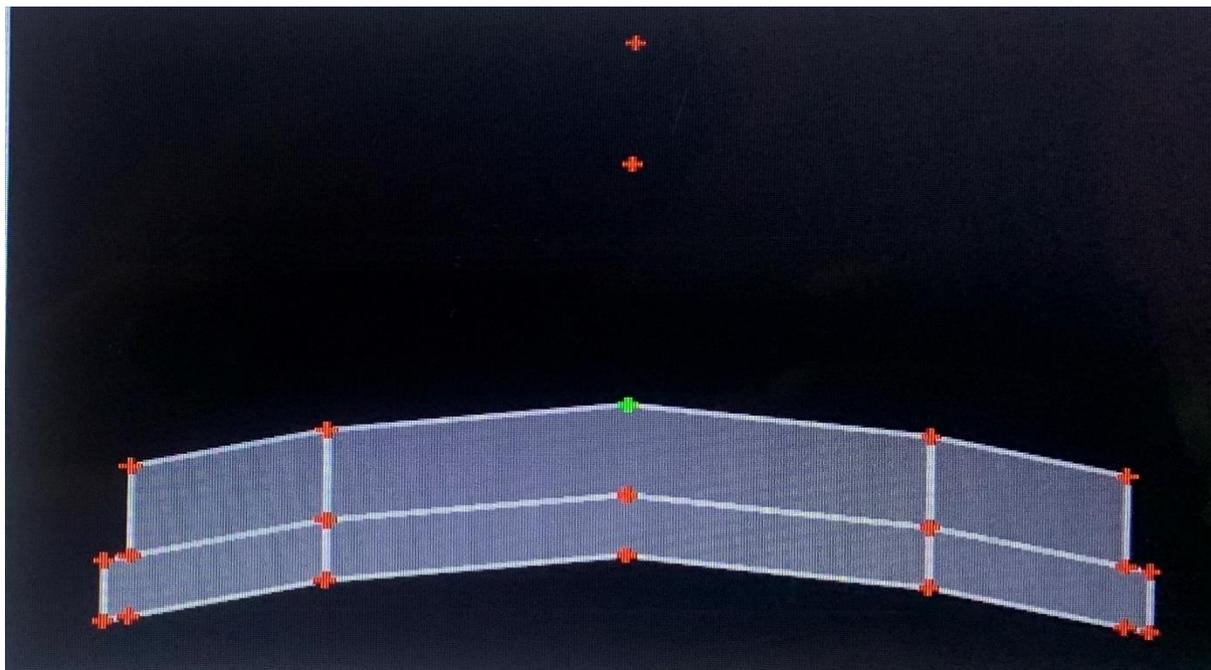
Concrete Pavement w/ Concrete Shoulder Undivided 2 Lanes
